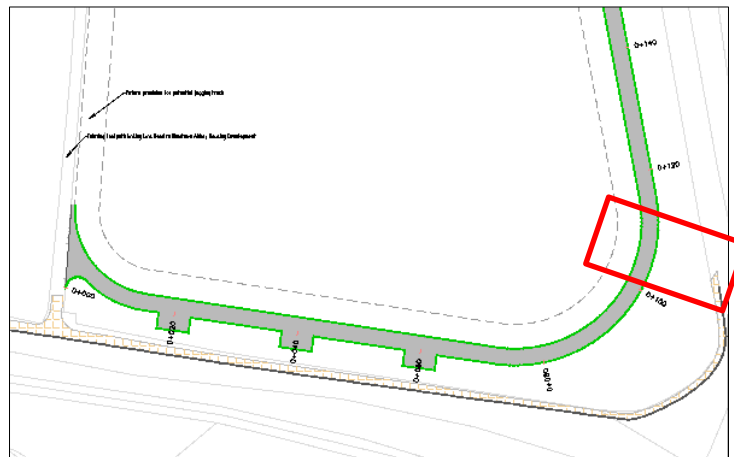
Existing / Proposed Footway (Dwg No. 11587-2420-D02)
